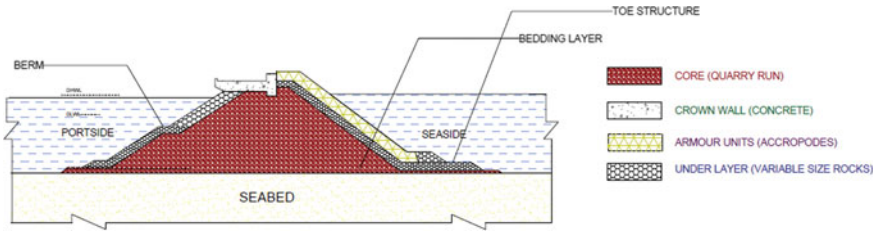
Typical cross-section of Rubble mound breakwater provided with berm
